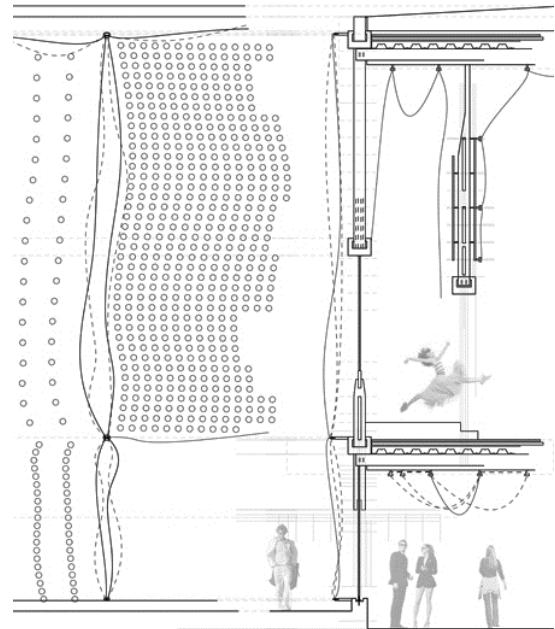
Large-scale (1:12) building sections and elevations developed early in the design process, while concepts were still fluid and indeterminate. Student work by Martin Fernandez for Architectural Design 6, ARC 3321, Spring 2013. Instructor: Bradley Walters.
